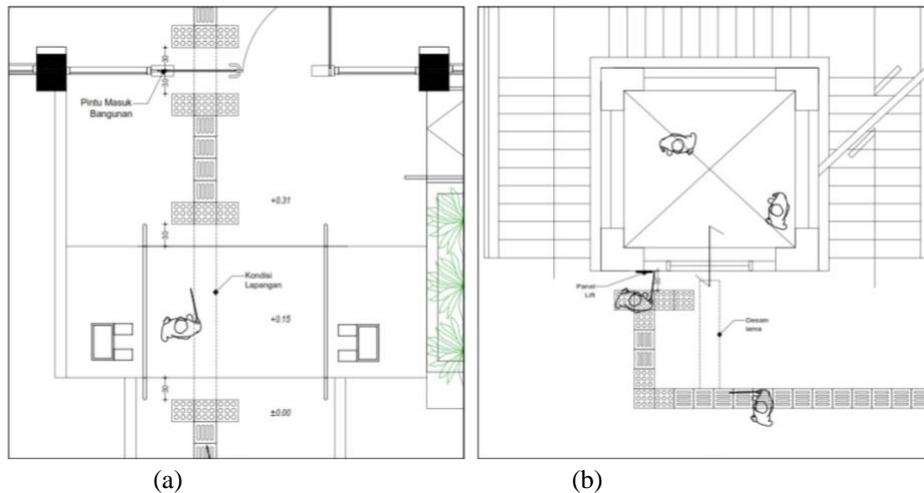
(a) Recommended tactile paving design at the entrances and (b) elevators
